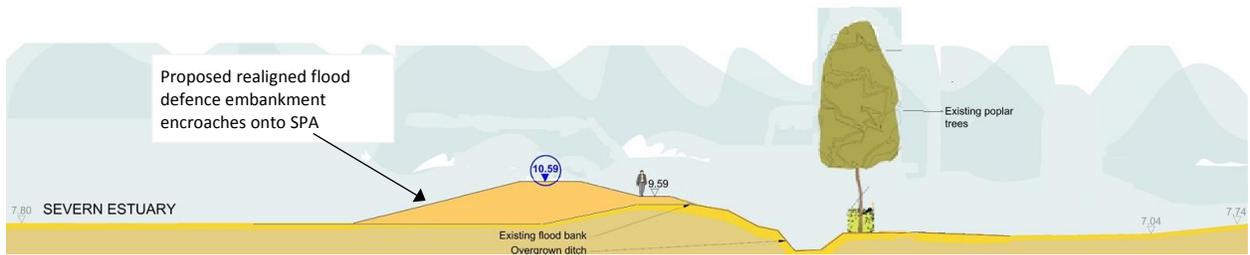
Typical Cross Section Through Alternative Flood Defence Embankment Encroaching into SPA
